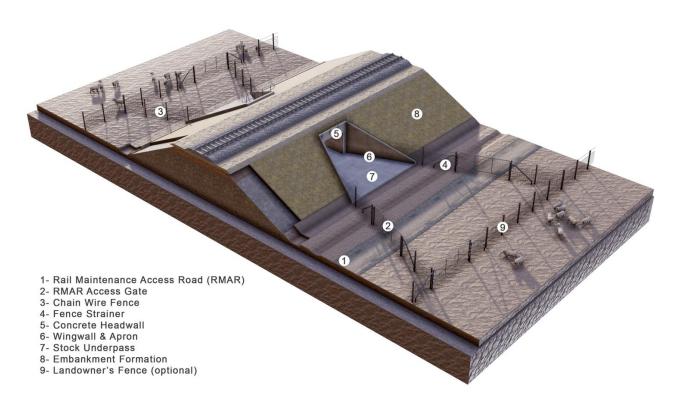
INDICATIVE LAYOUT OF A STOCK UNDERPASS (SUBJECT TO DETAILED DESIGN)
